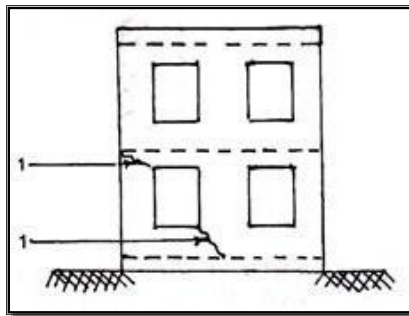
Crack at the corner of building due to foundation settlement.
